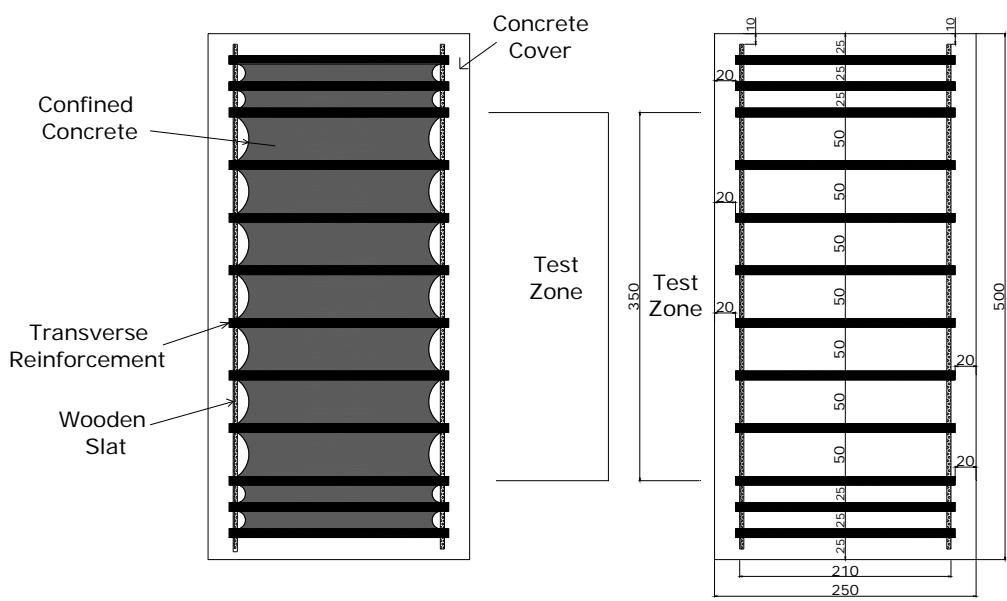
Transverse reinforcement detailing (all dimensions are in mm)
